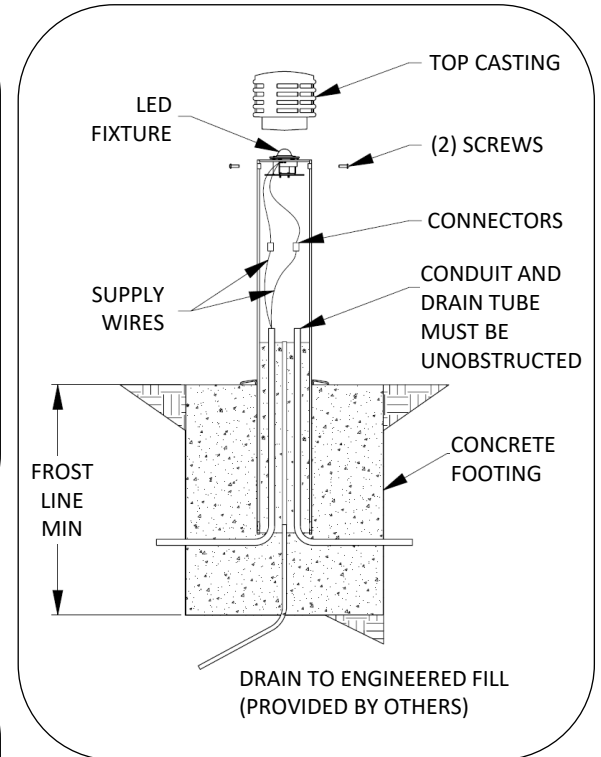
ALTERNATE FOOTING DETAIL FOR EMBEDDED BOLLARD WITH LOW VOLTAGE LIGHT
